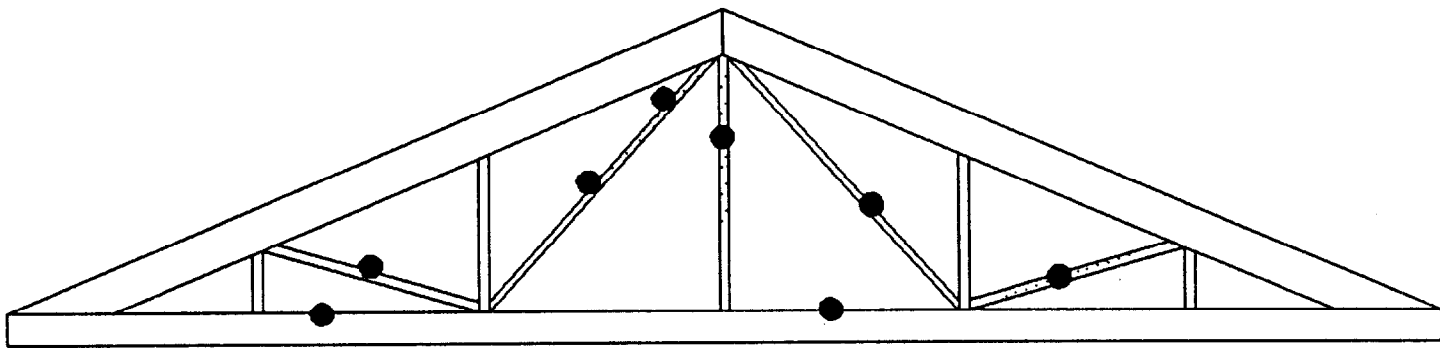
Building 17 Attic Ceiling Supports, Area #11 - Measurement Locations
